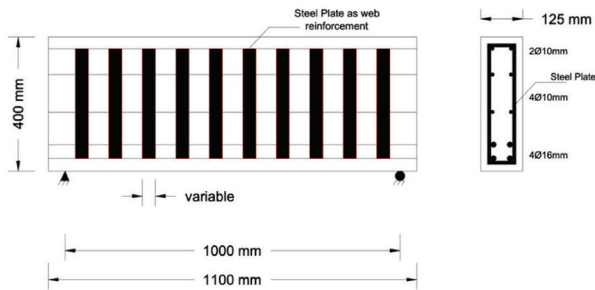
Details of self-compacting concrete deep beam with steel plate as web reinforcement
